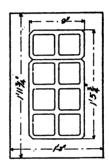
McRoy Tile, 8-Duct Conduit, Class "A" Construction.
